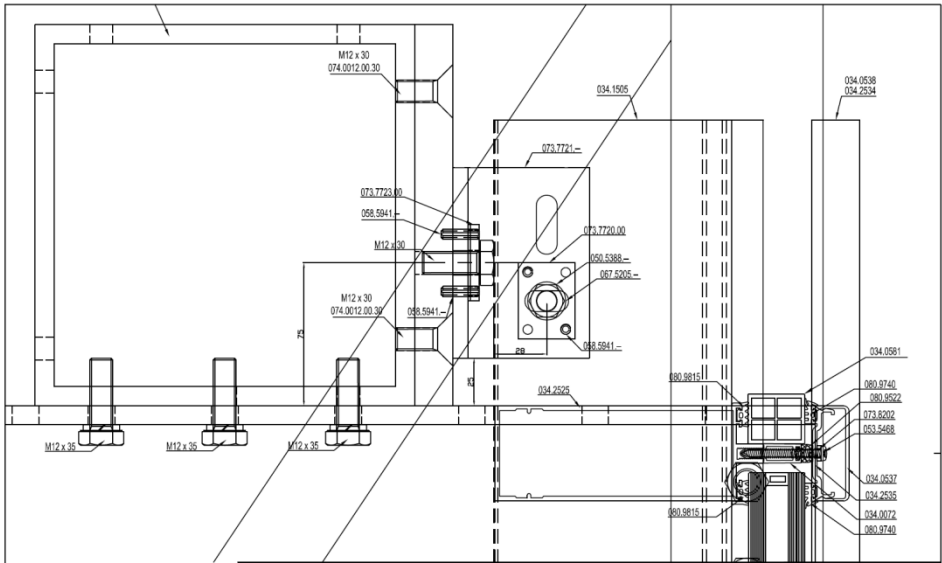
top anchorage to the steel structure (fixed anchor)
